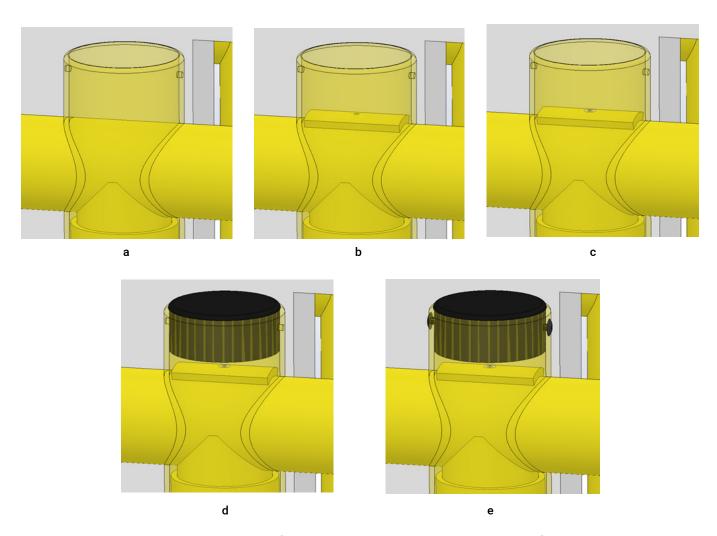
Fixing the top of the post to the connection strap and installing of the cap.
